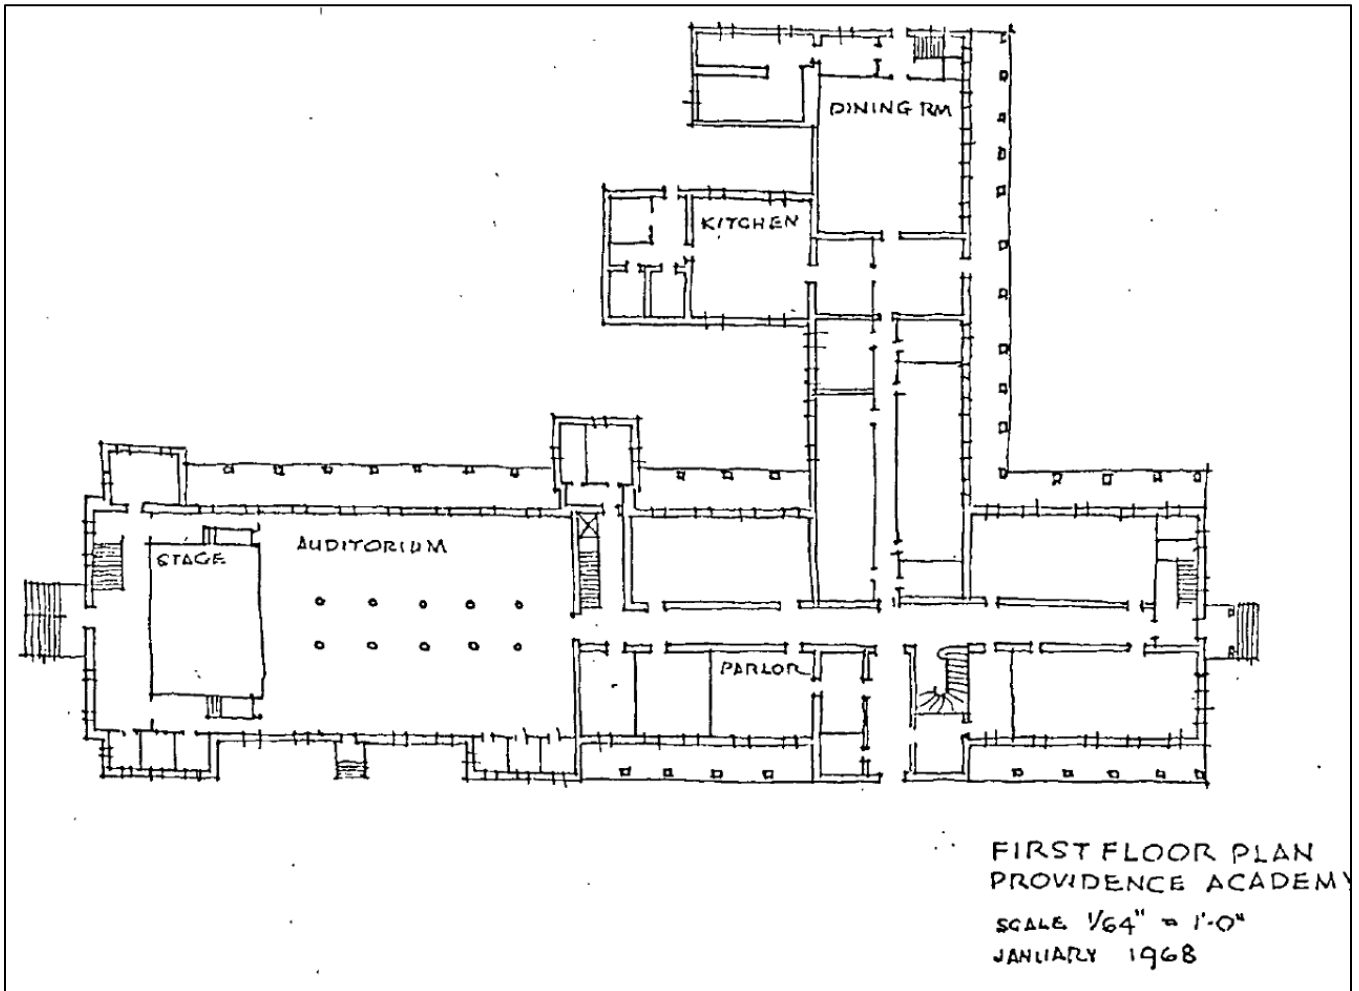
House of Providence first floor plan in 1968 (Lentz, "House of Providence, Vancouver, Washington," Supplemental materials).
